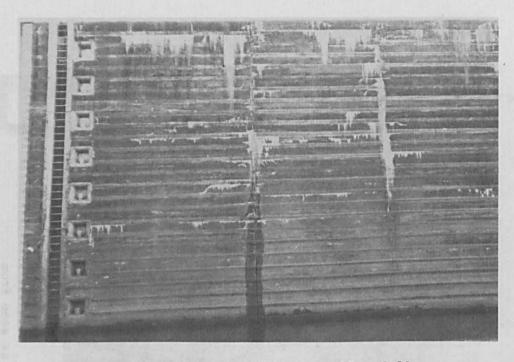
Cracking in Monolith No. 20 as seen from gallery looking downstream.
